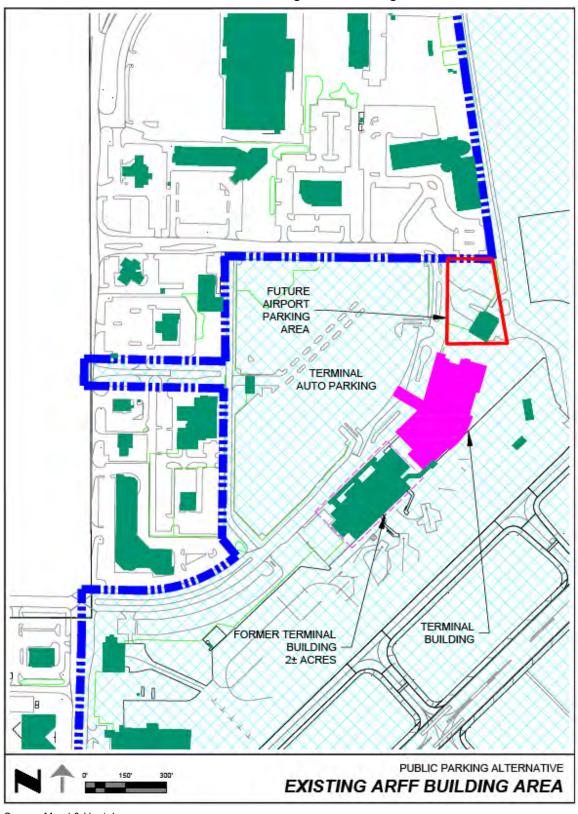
Alternative 17 – Existing ARFF Building Area
